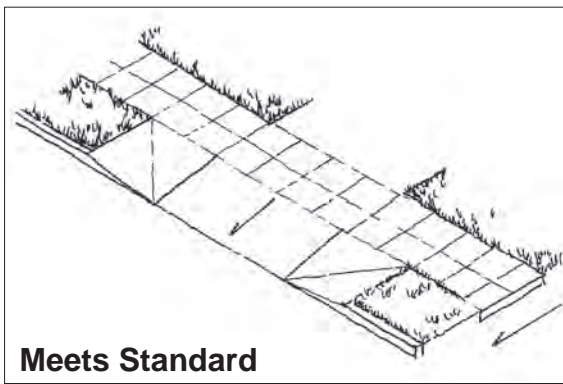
v and 5.4.4.w: Diagram and photo example of continuous paving across driveway.
